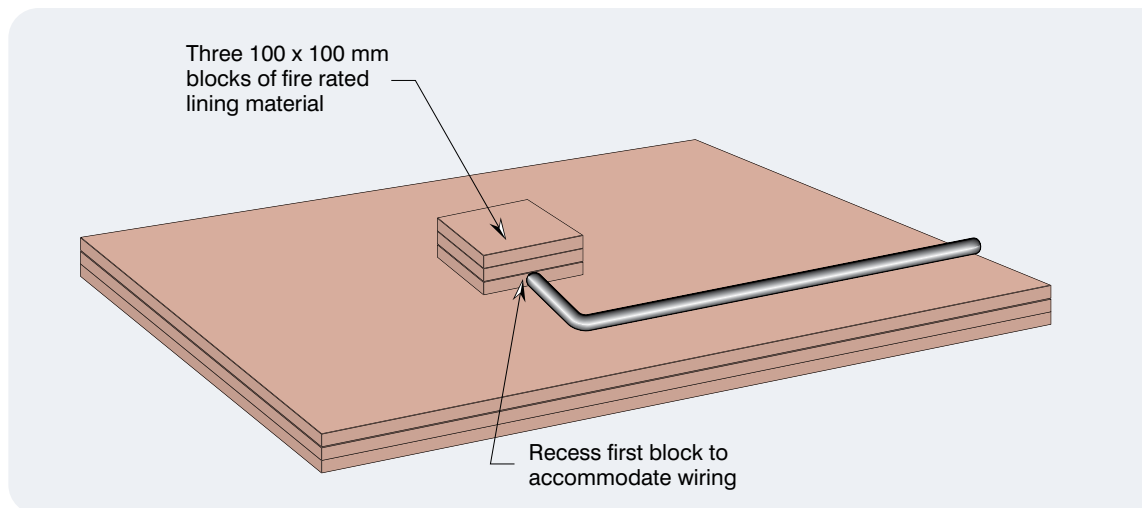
Recess block protection system for lighting cables penetrating fire-protected timber floors.
